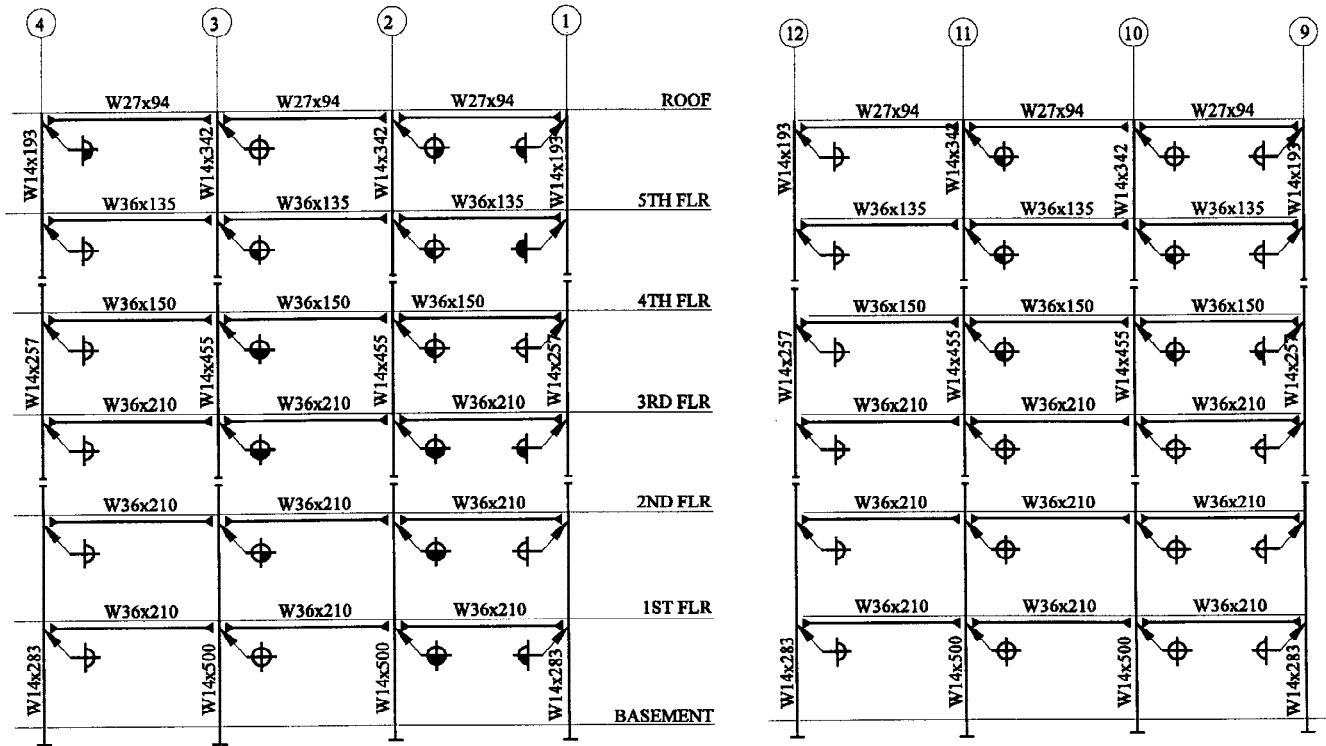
Elevation Showing Location of Weld Damage.
